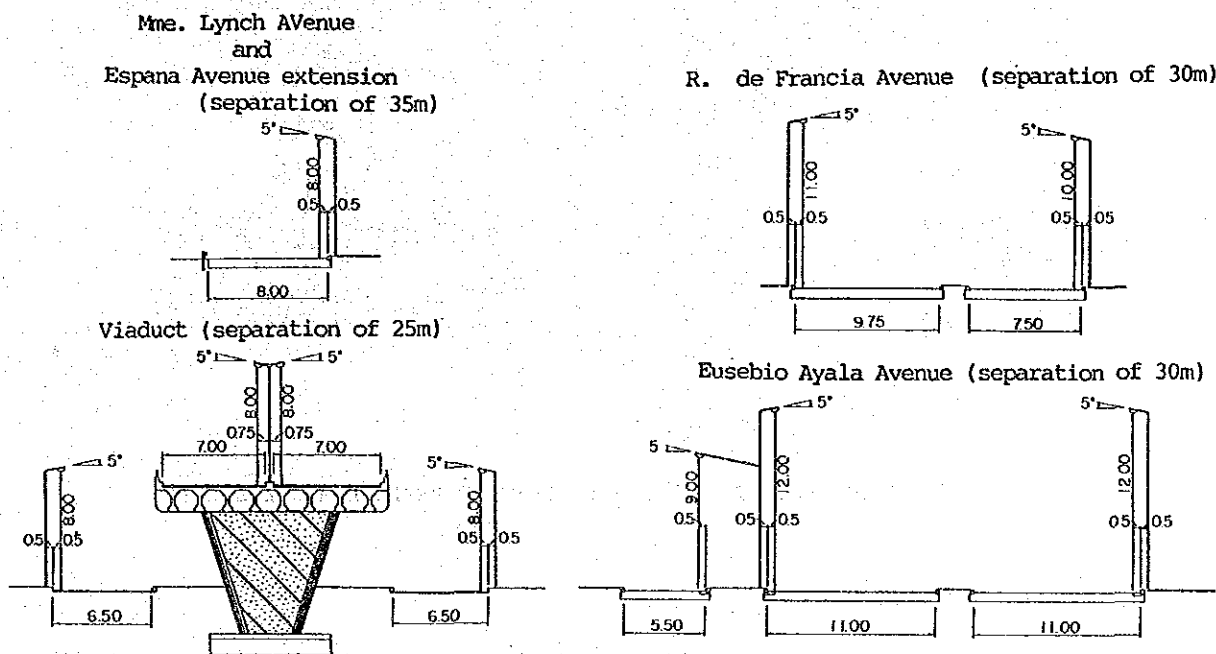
TYPICAL ILLUMINATION TYPE BY SECTION
